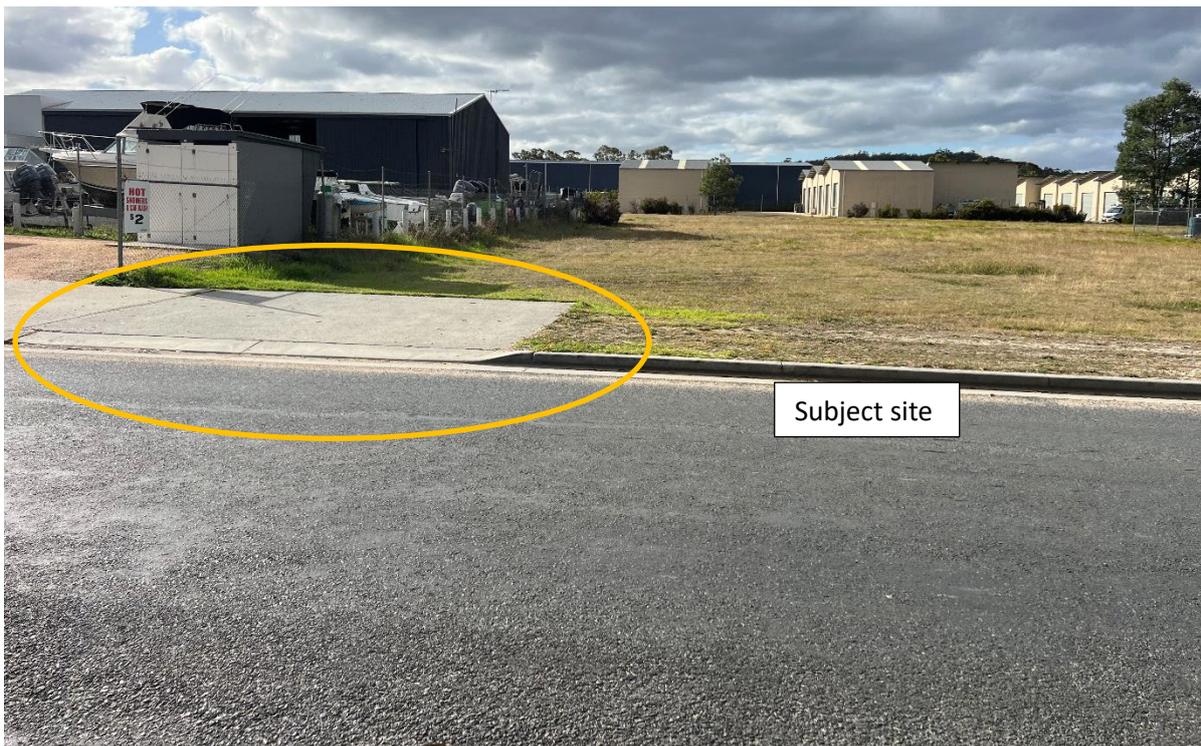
Existing Property Access – Concrete driveway and crossover
